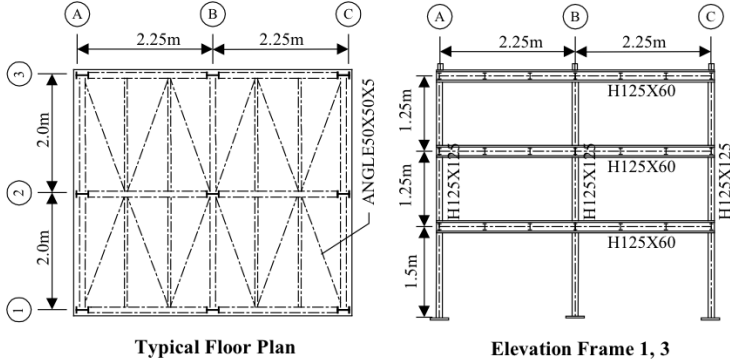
Typical Plan and Elevation of the Designed Structure
